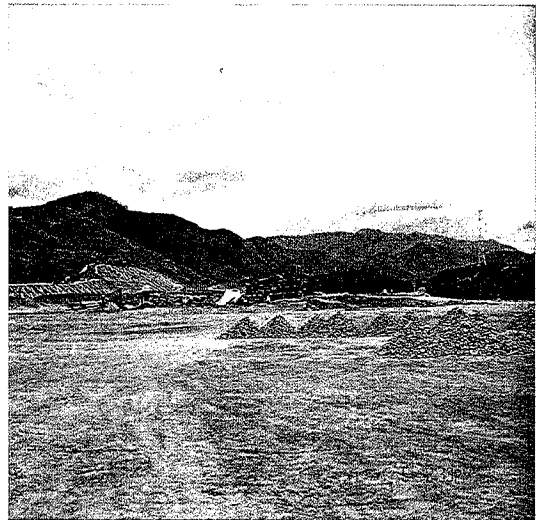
The borrow pit ground on the back of Heqing station needs slope cutting protection
